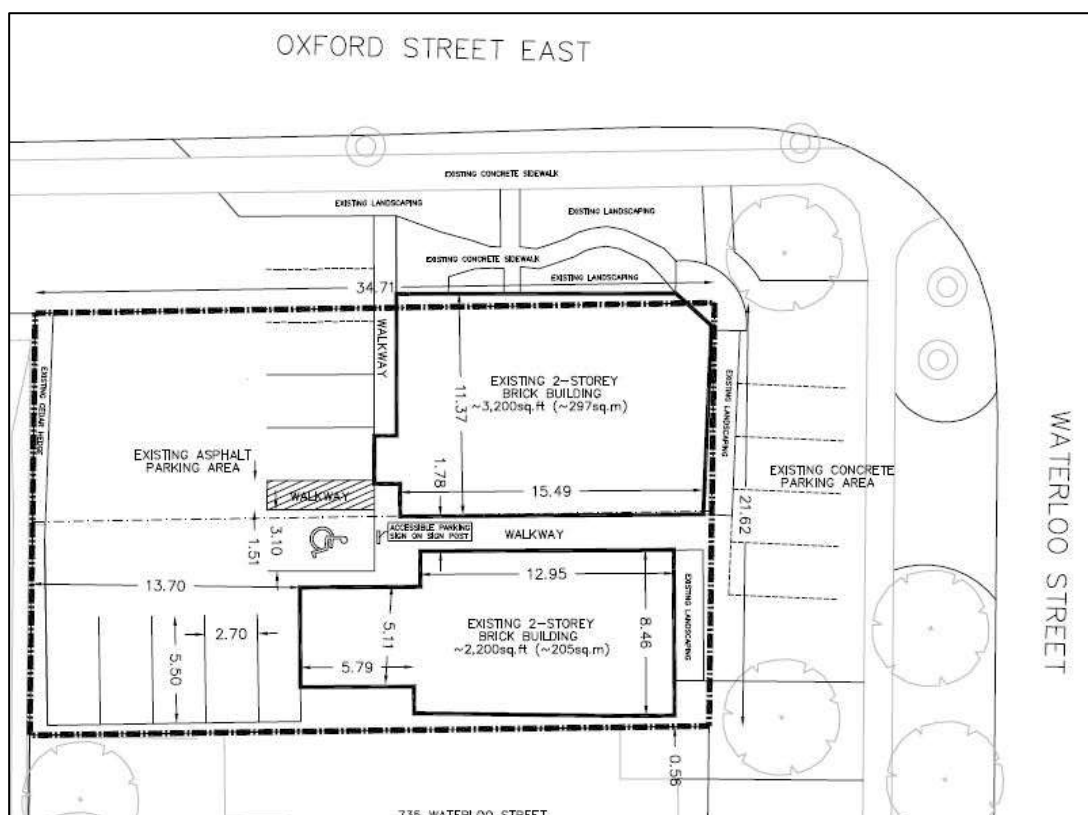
Site Plan of Existing Conditions (provided by the applicant)
